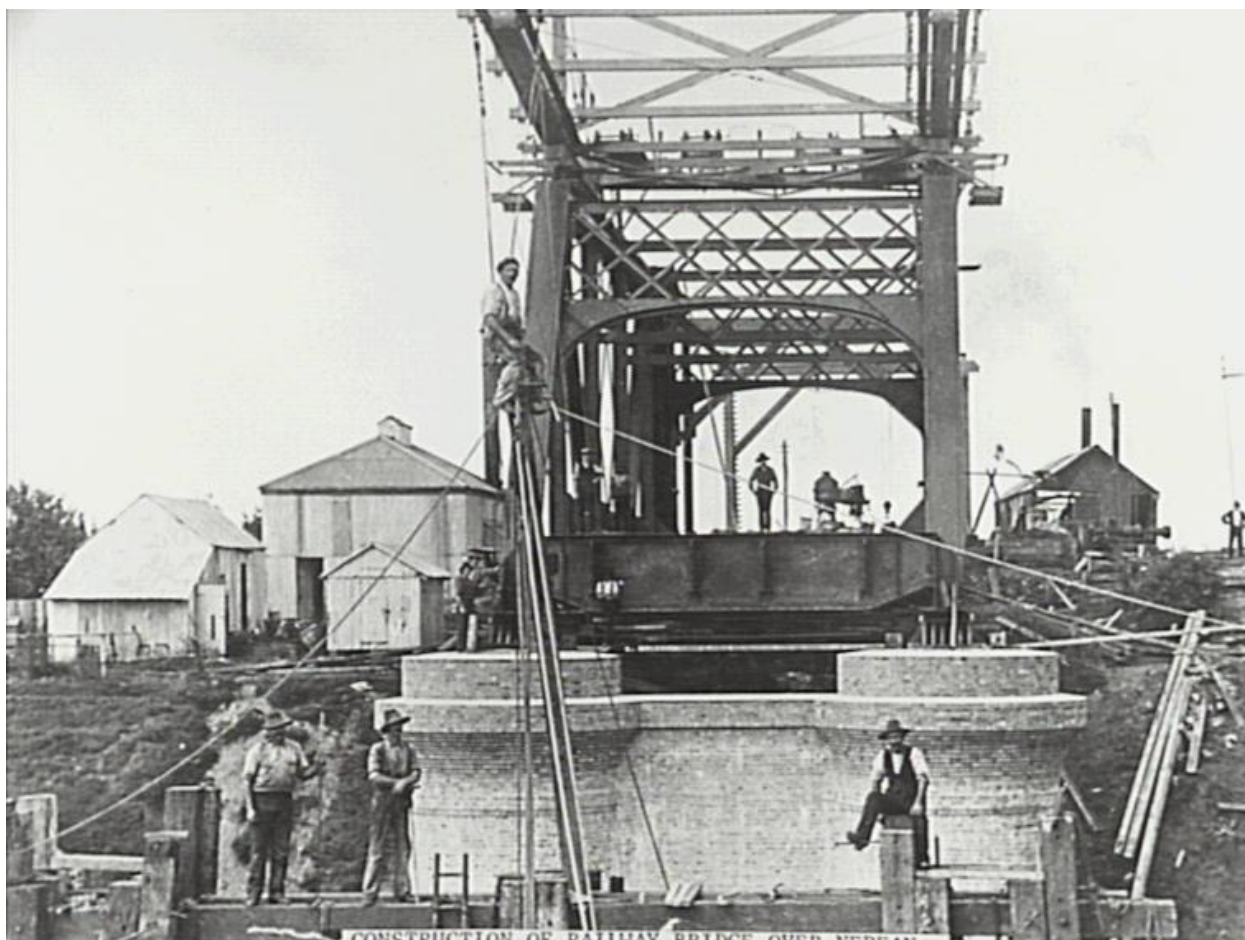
1907 photograph of the construction of the Railway Bridge over the Nepean River.
